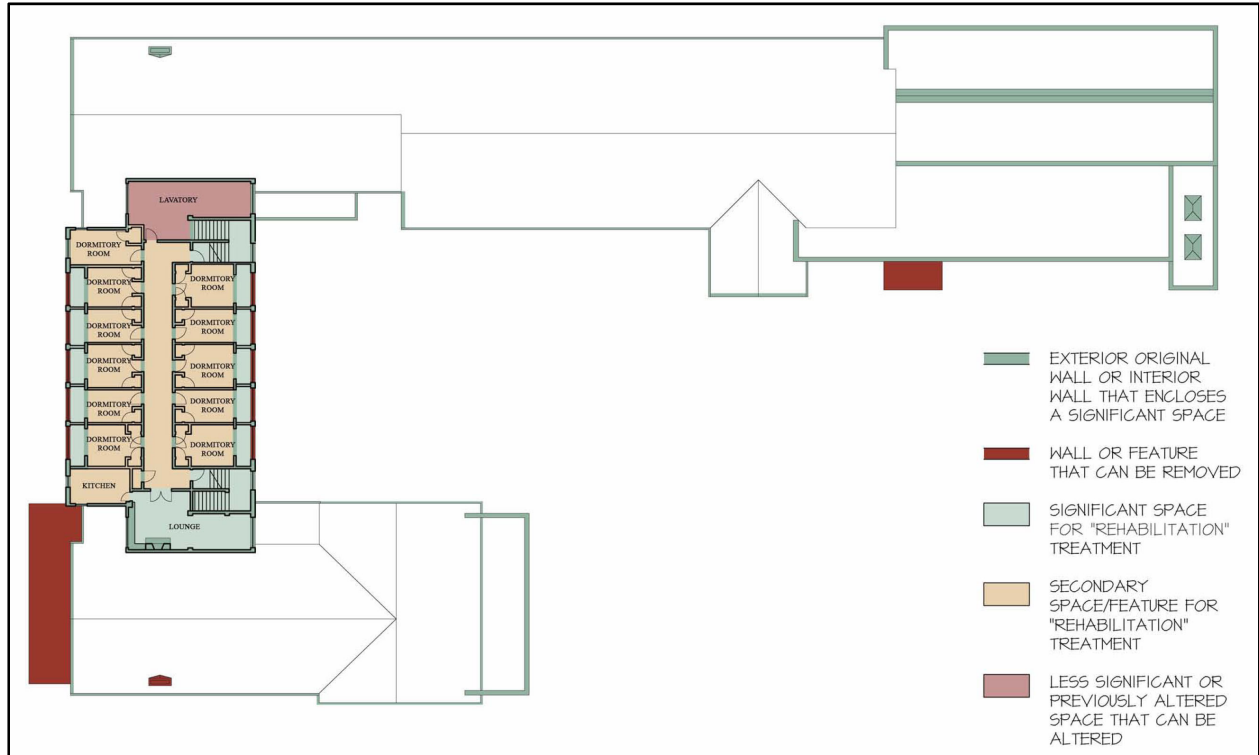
ARG 2011 Rehabilitation Study - YWCA Building Existing Second Floor Layout
